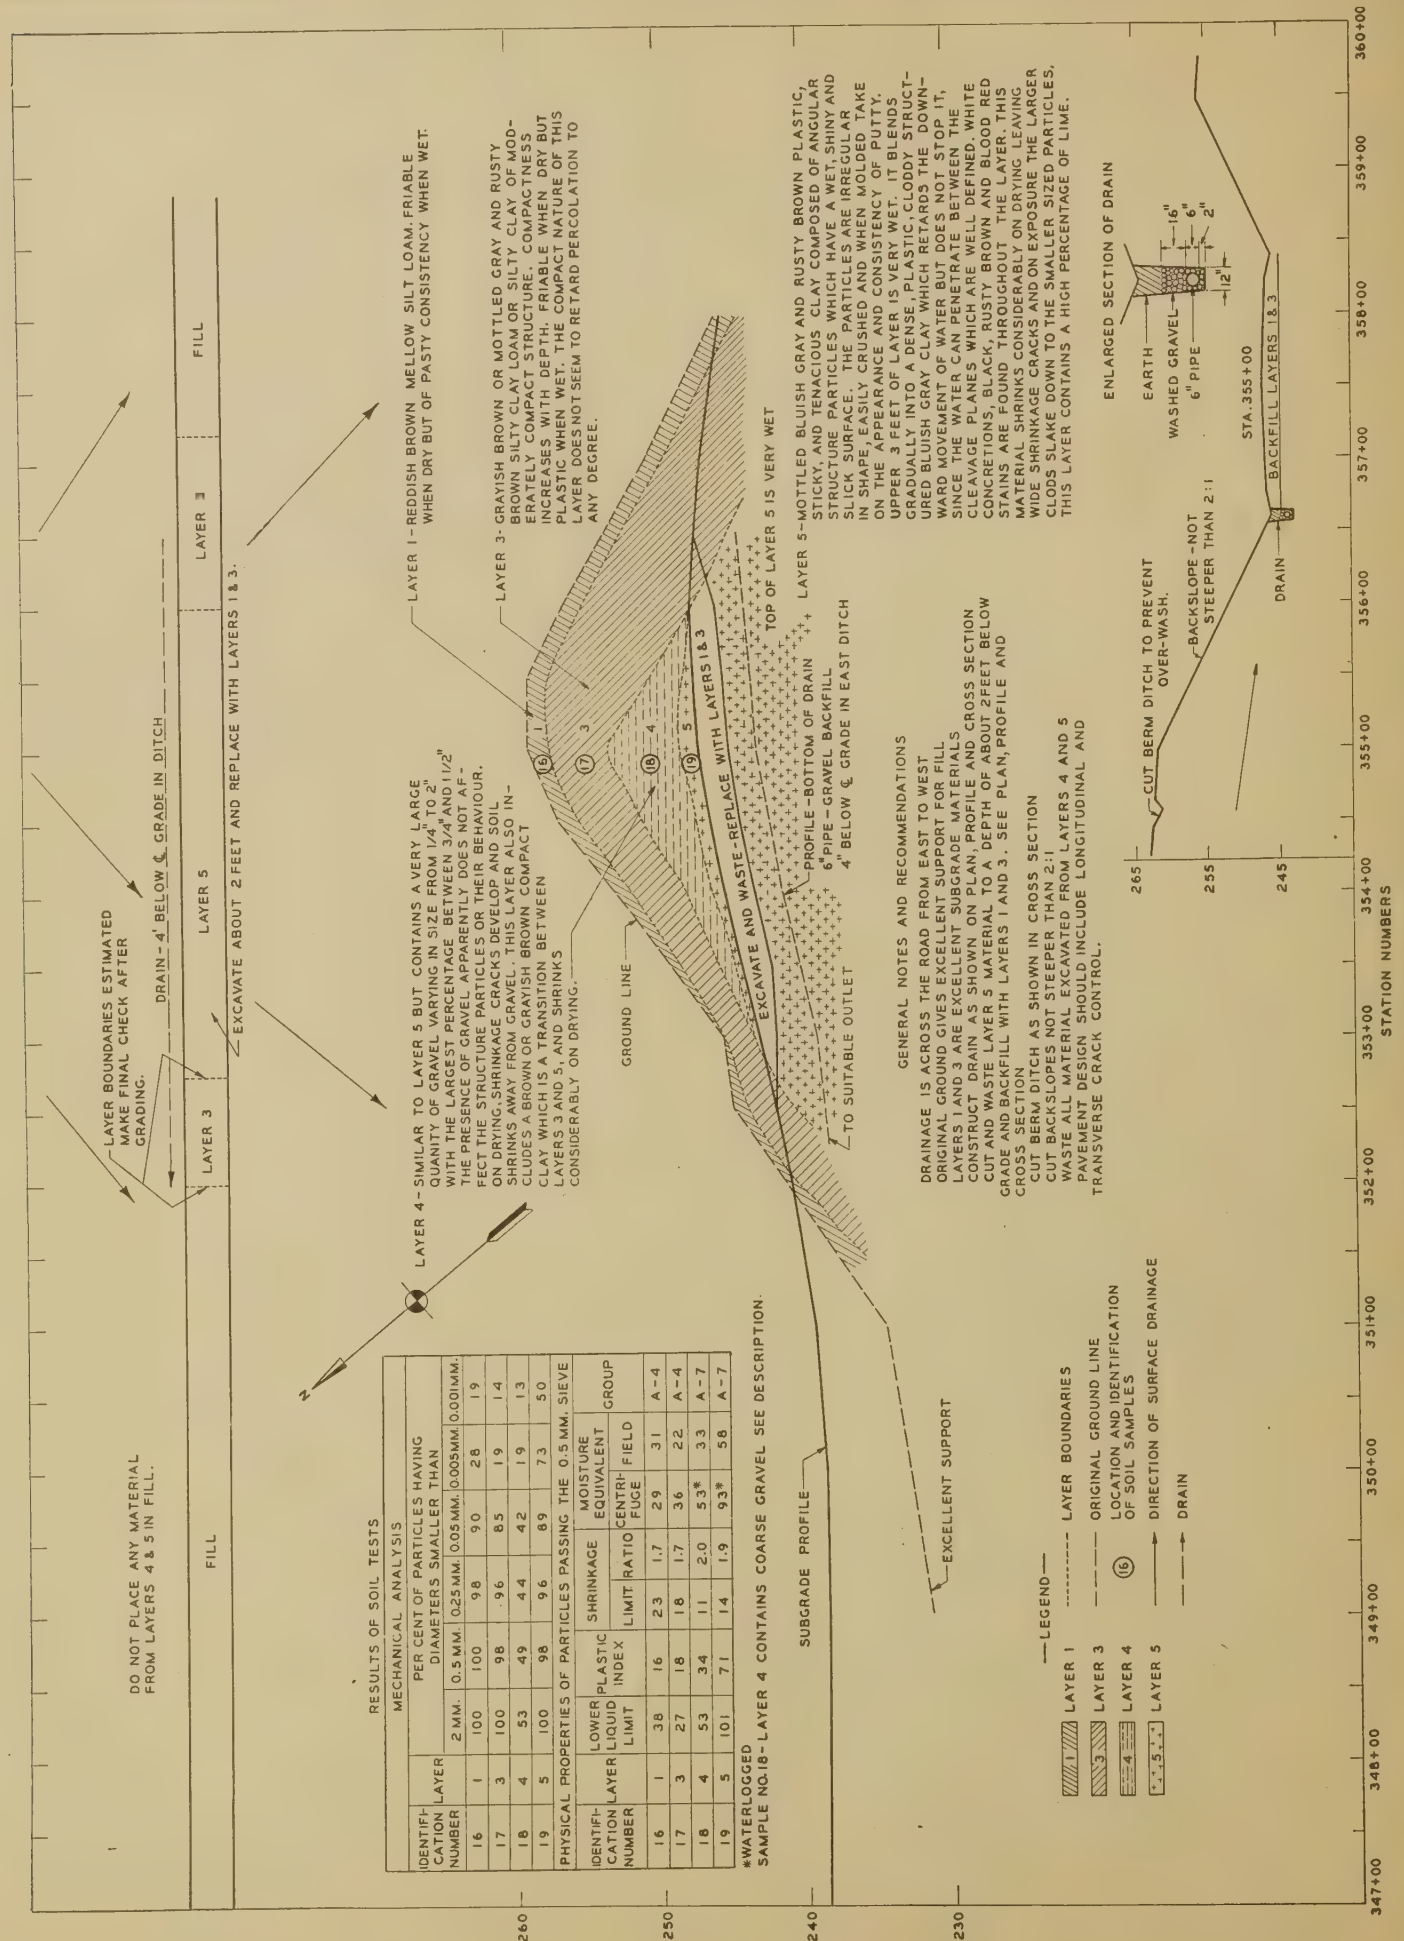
SUBGRADE SURVEY SHEET FOR THE DESIGN OF NEW ROAD
